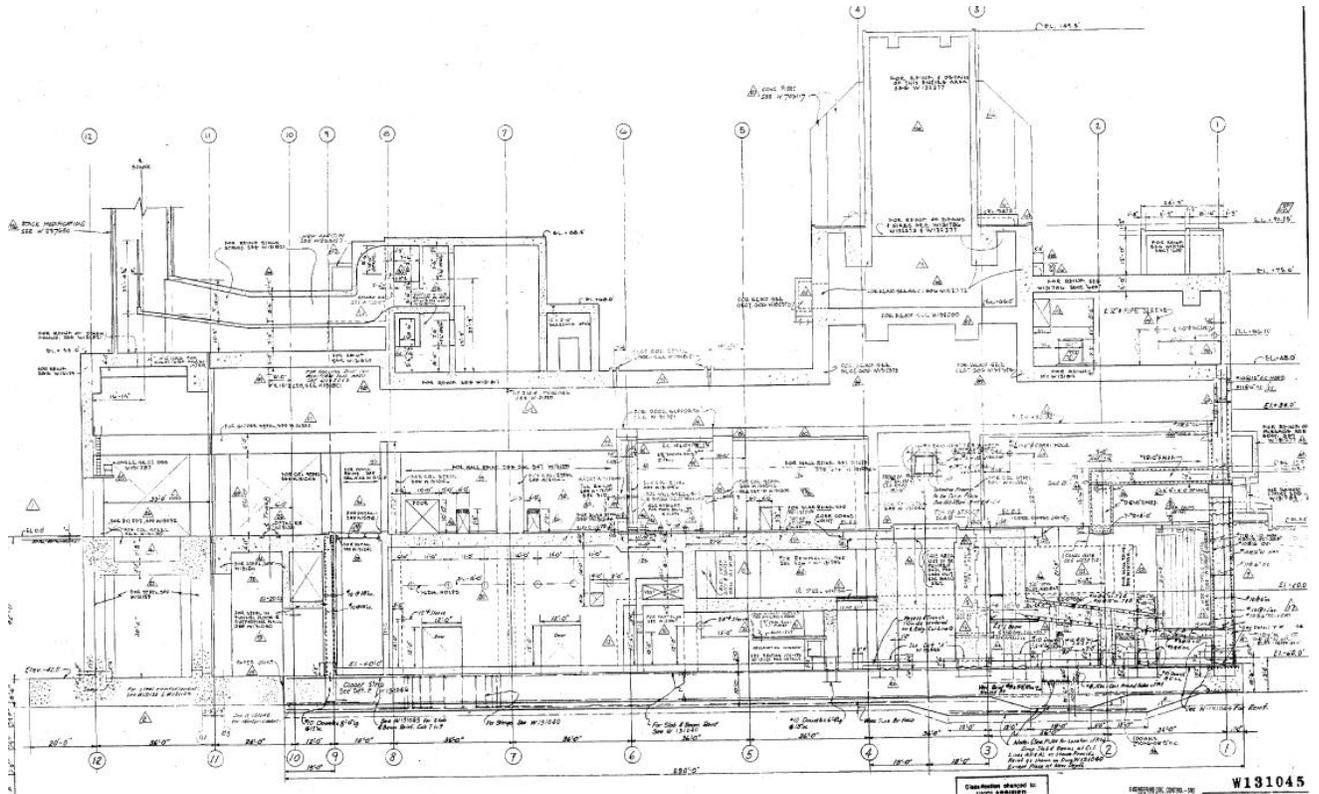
Cross-Section of 105-P Facility (looking south).
